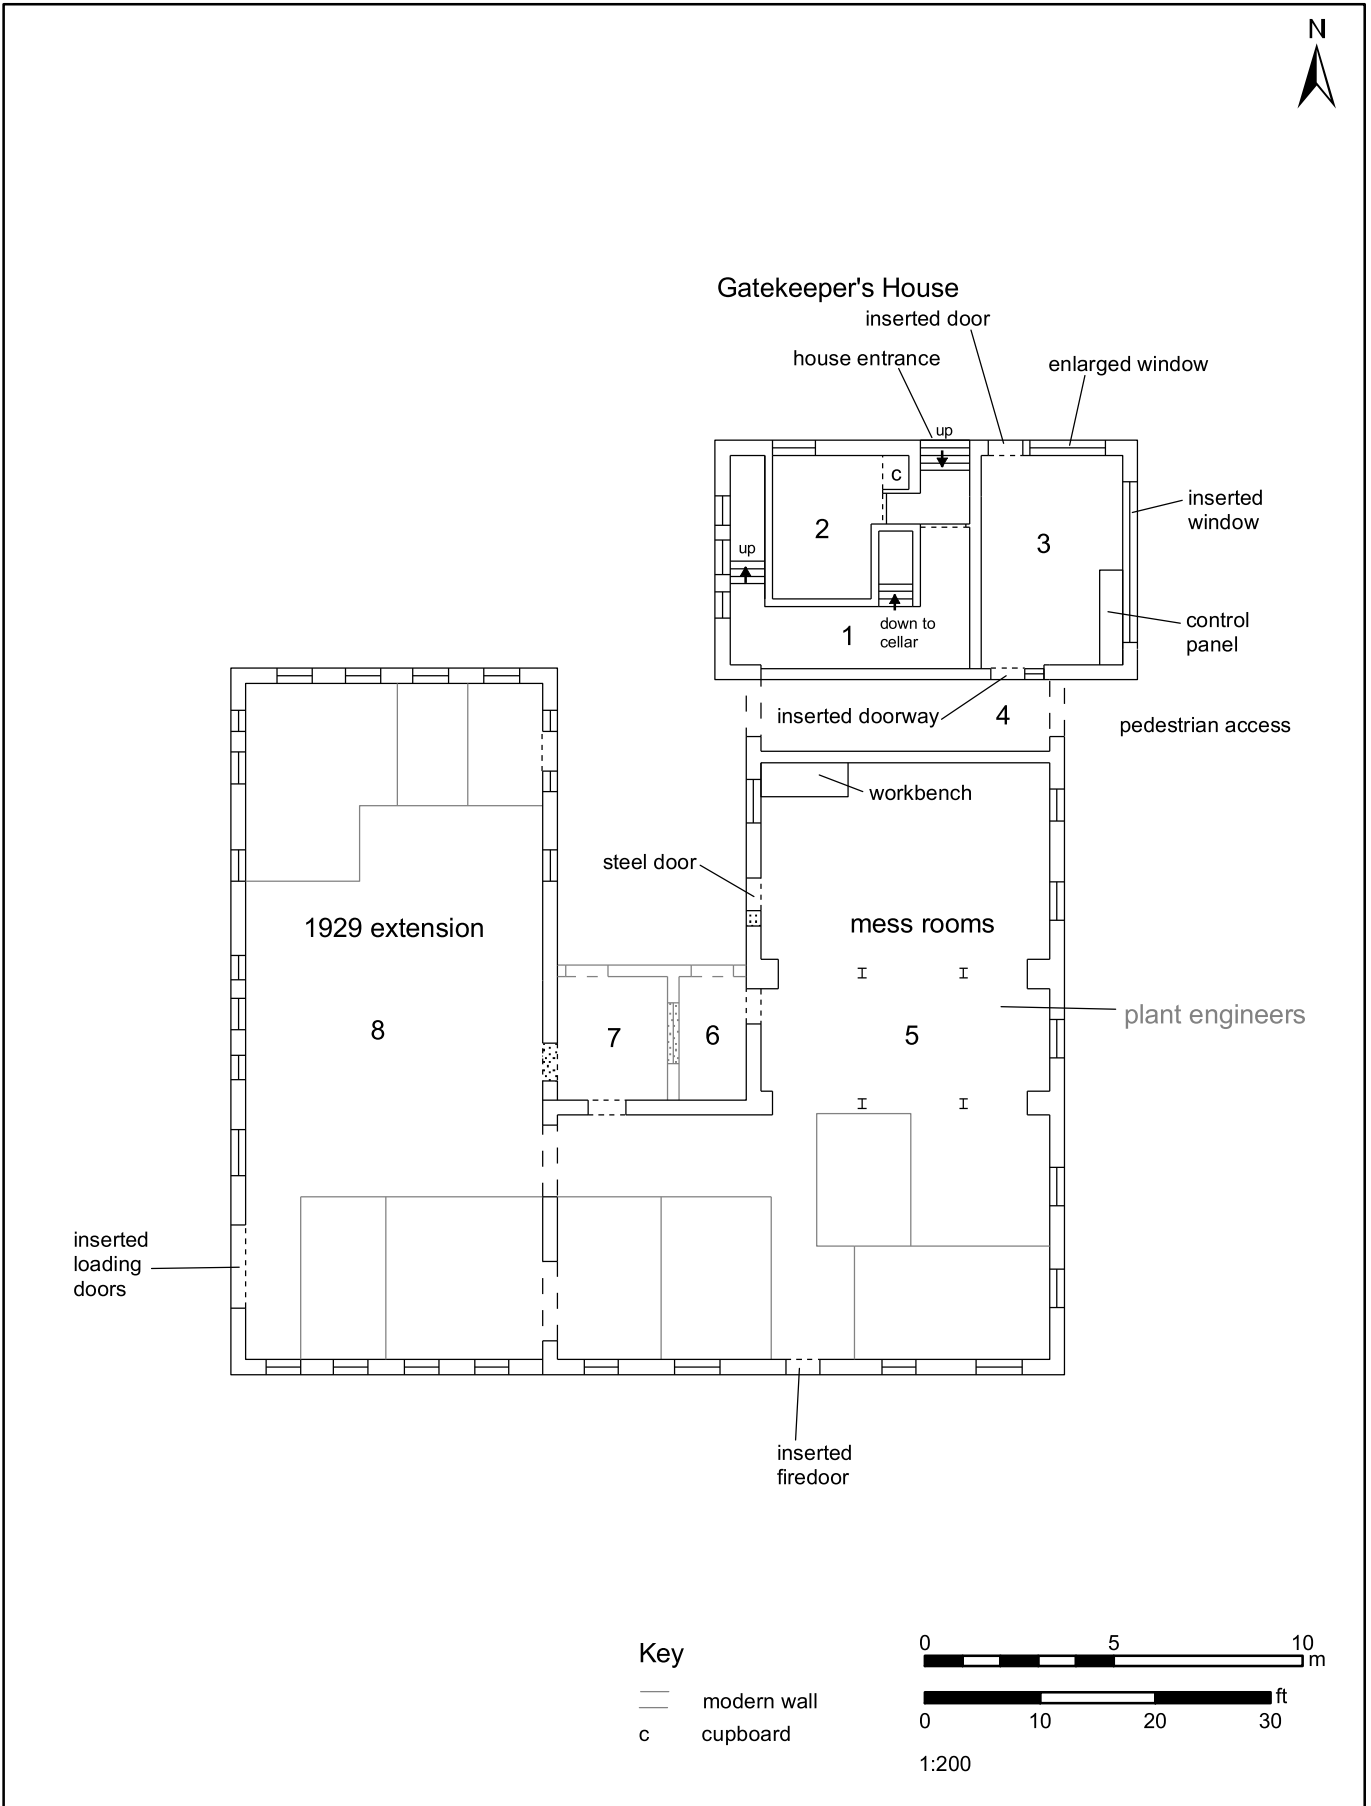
Gatekeeper's house, mess rooms and 1920's extension - ground floor plan
